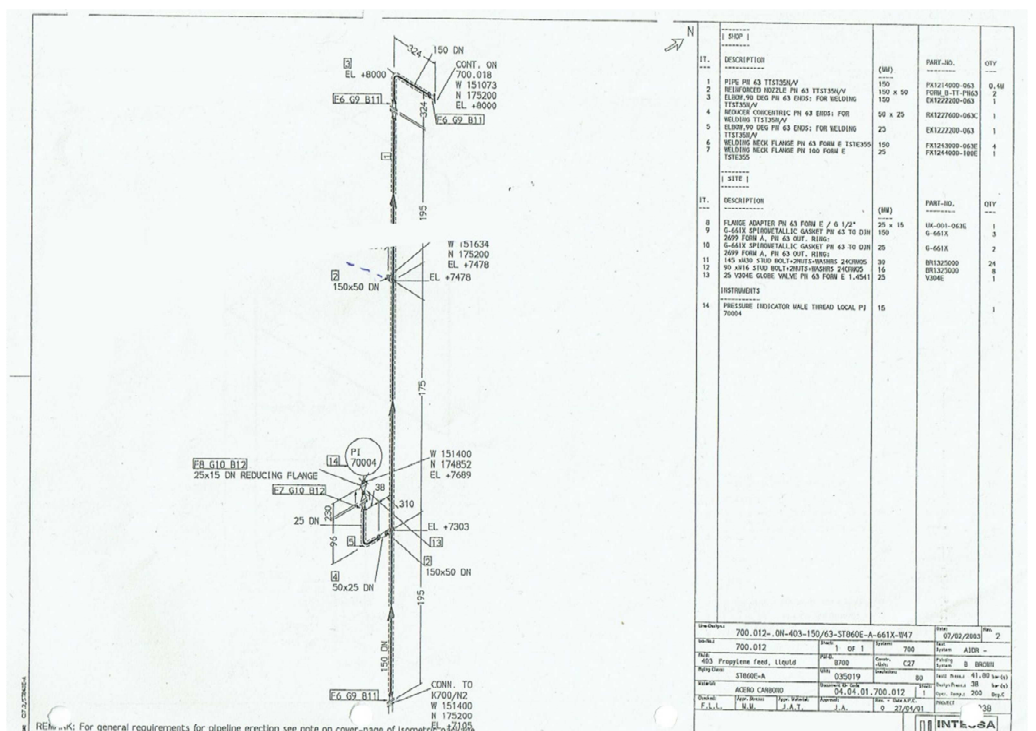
Isometric drawing of YS700-01 sheet 2.
